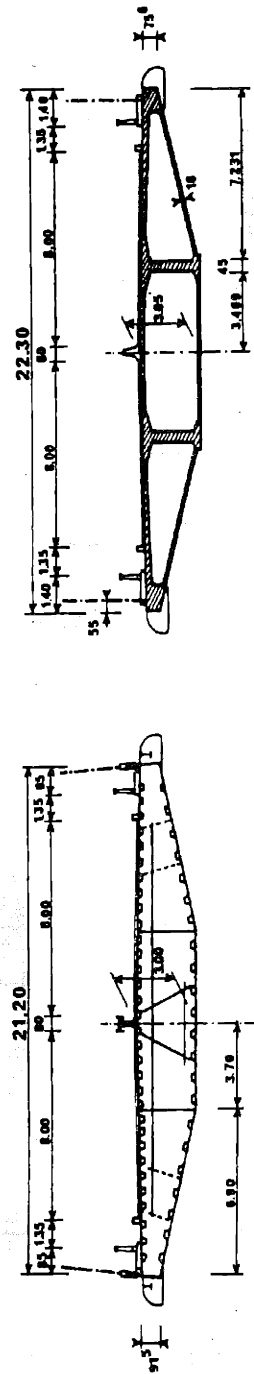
Typical cross-section for the steel part of the bridge (left). The cables are directly anchored through open sockets on the lateral webs of the box-girder. Typical cross-section for the concrete part of the bridge (right).
